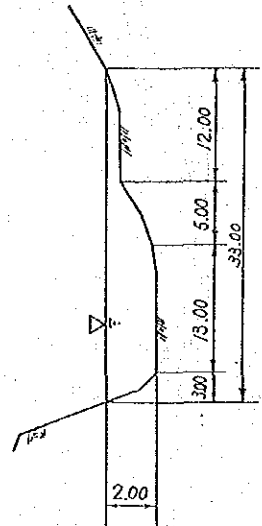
PLANNING LAYOUT OF FLOATING
